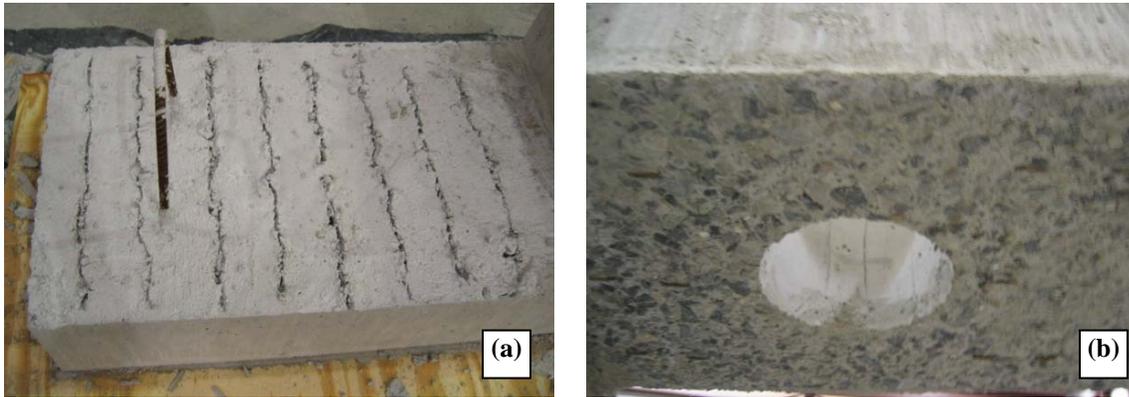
Beam Side (a) and Slab Side (b) Push-Off Specimen Surface Preparation
